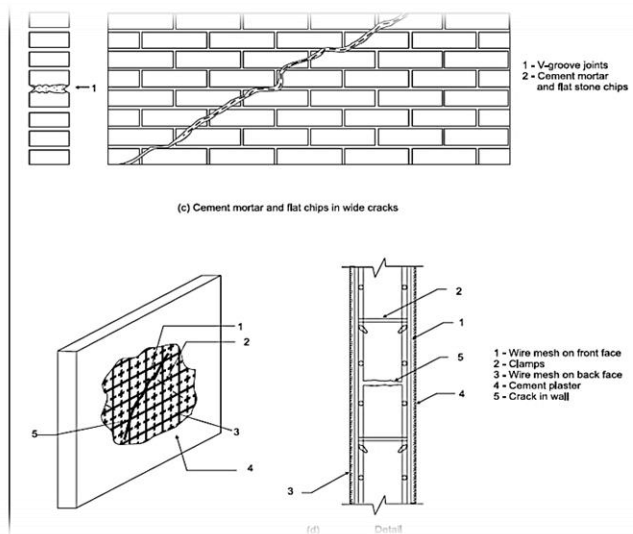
repair on damaged wall surface by shot Crete and wire mesh
